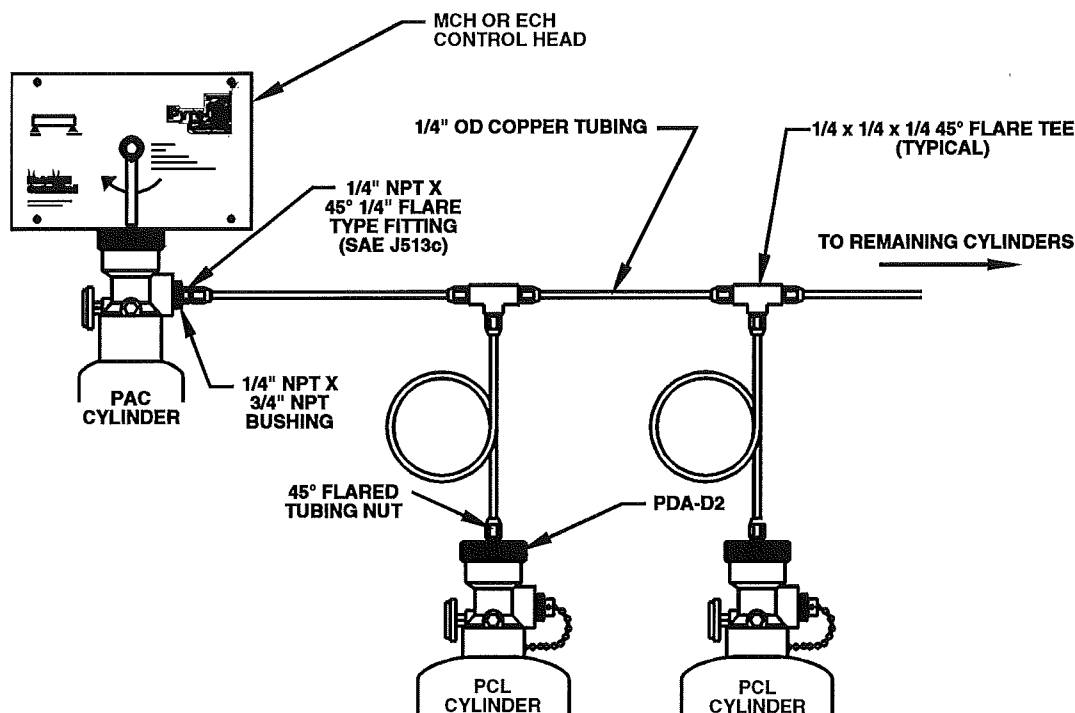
Multiple Cylinder Actuation Using Model MCH/ECH Control Head.
